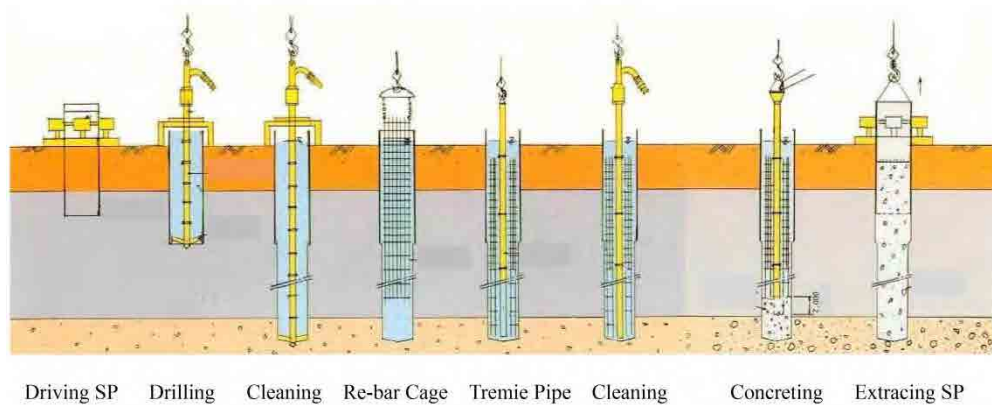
Construction Method of In-Situ-Concrete Pile
